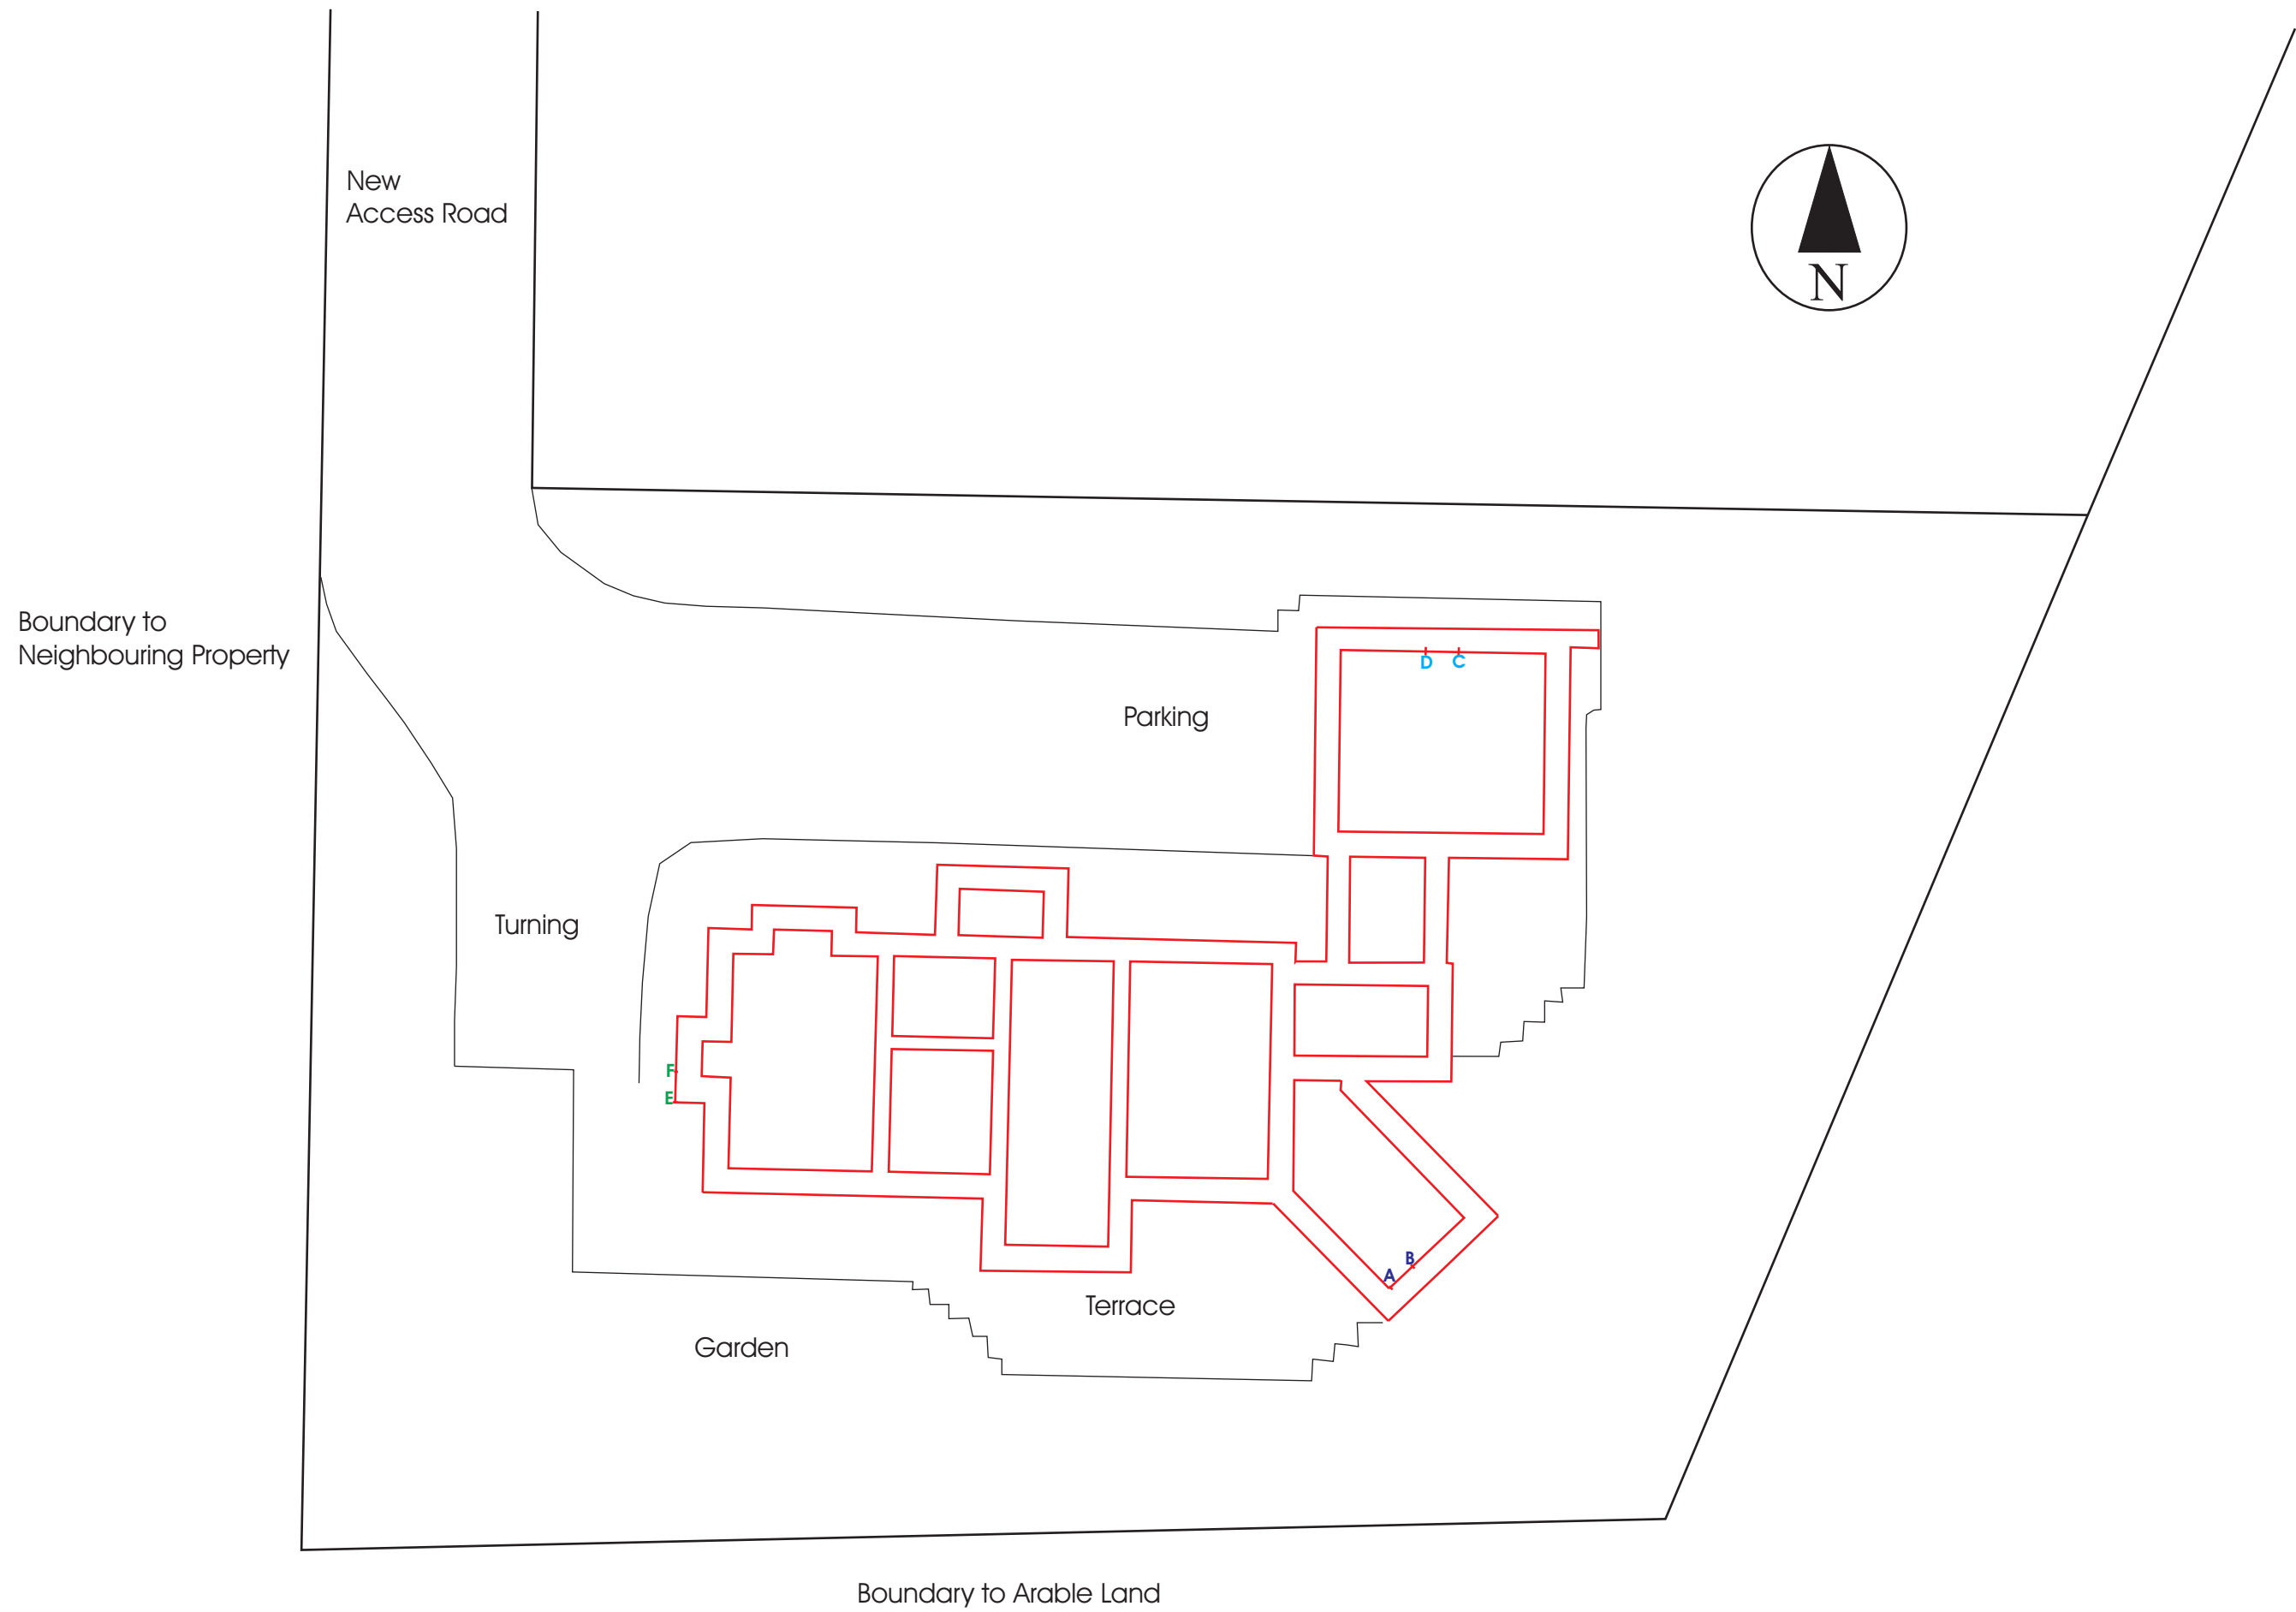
Location Plan Showing Footings of New Development (in red) and Section Locations (lettered). Scale 1:200@A3
